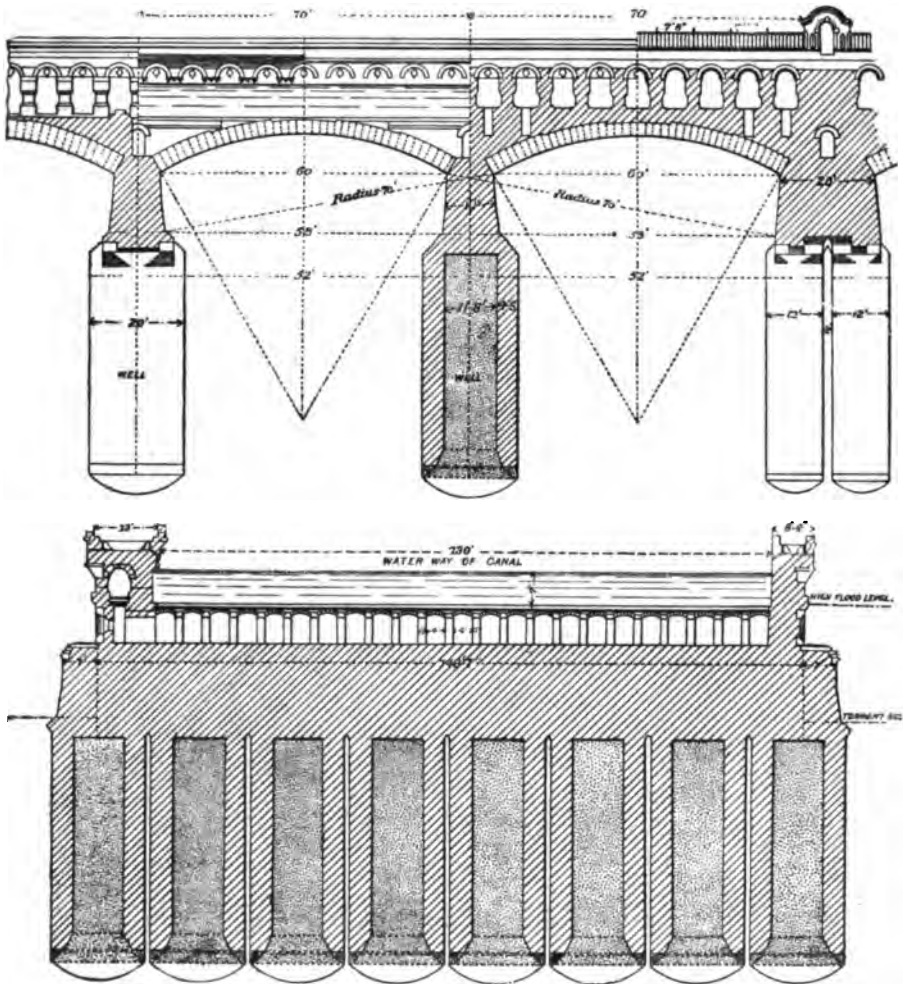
Elevation and Cross-section of Nadrai Aqueduct, Lower Ganges Canal, India.
